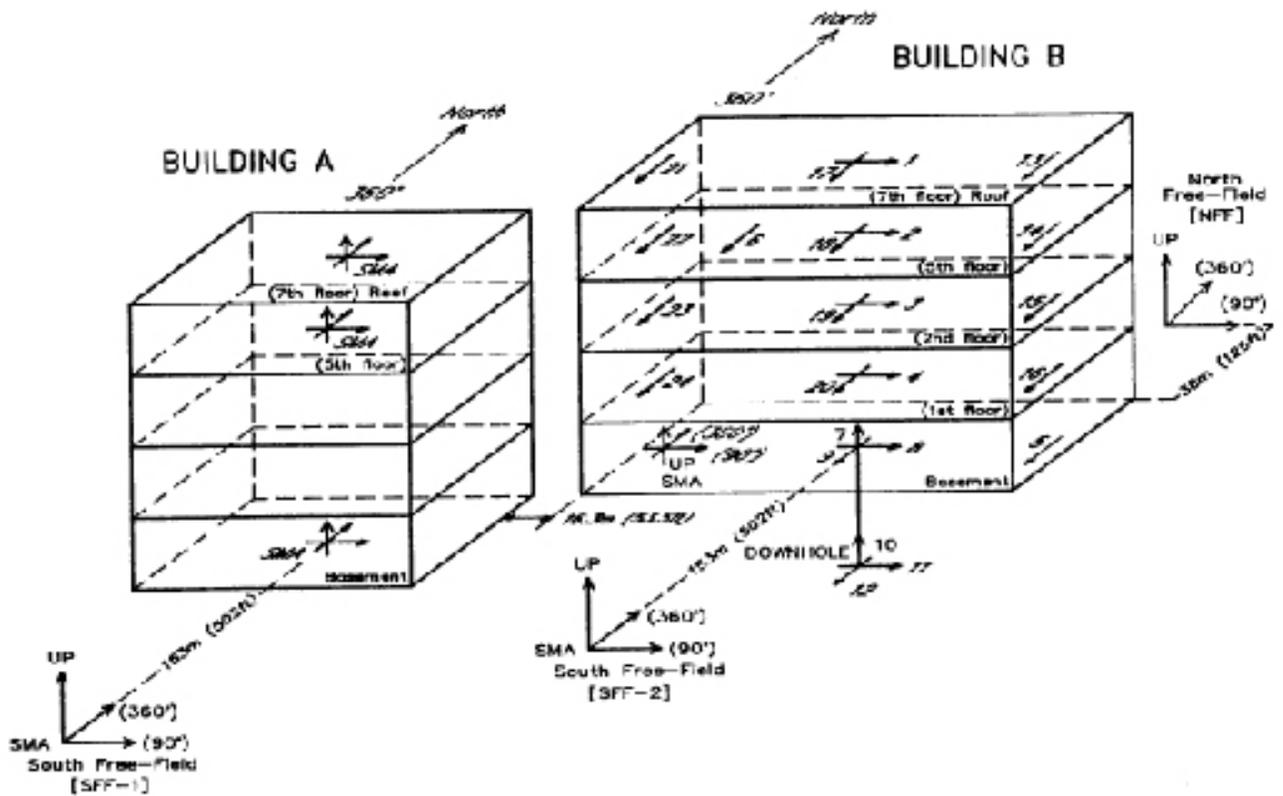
Two instrumented buildings in Norwalk, Calif. Building B has a downhole instrument within a caisson.
